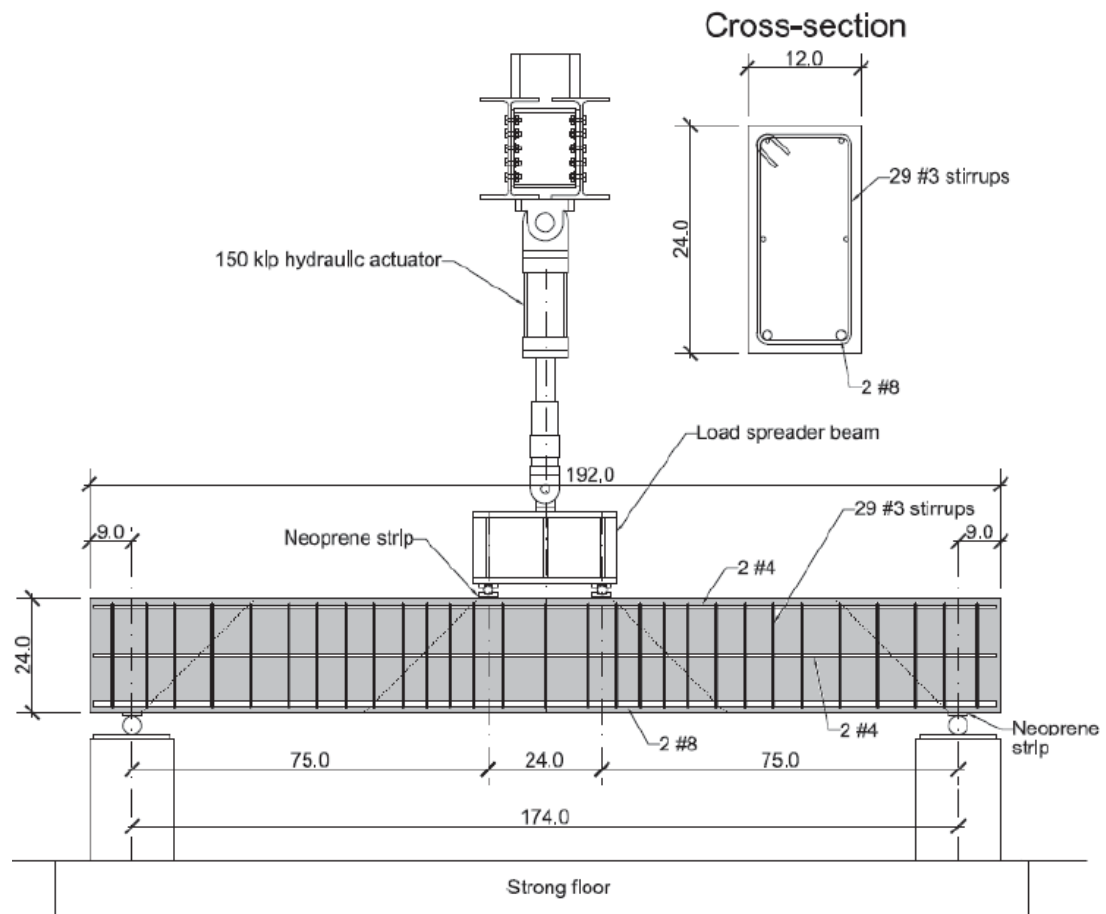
Flexure beam elevation view of reinforcing details, geometry, and the typical beam loading setup for four-point bending test. Courtesy by: Thomas Schumacher.
